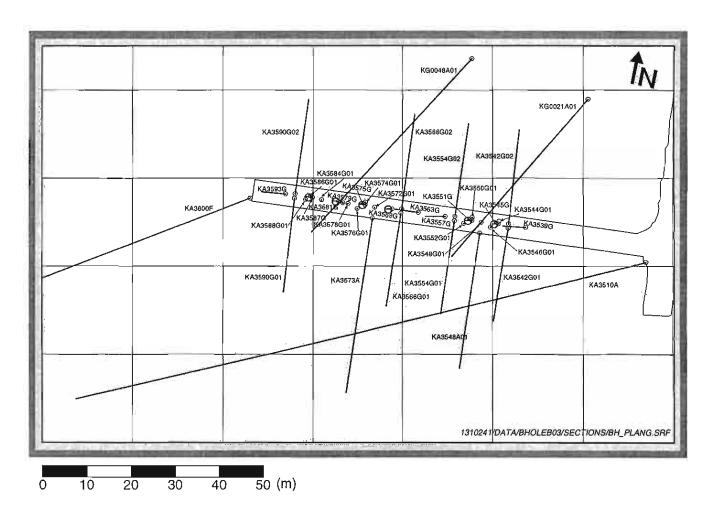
Location of the bore holes drilled during drill campaign 1, 2 & 3.
